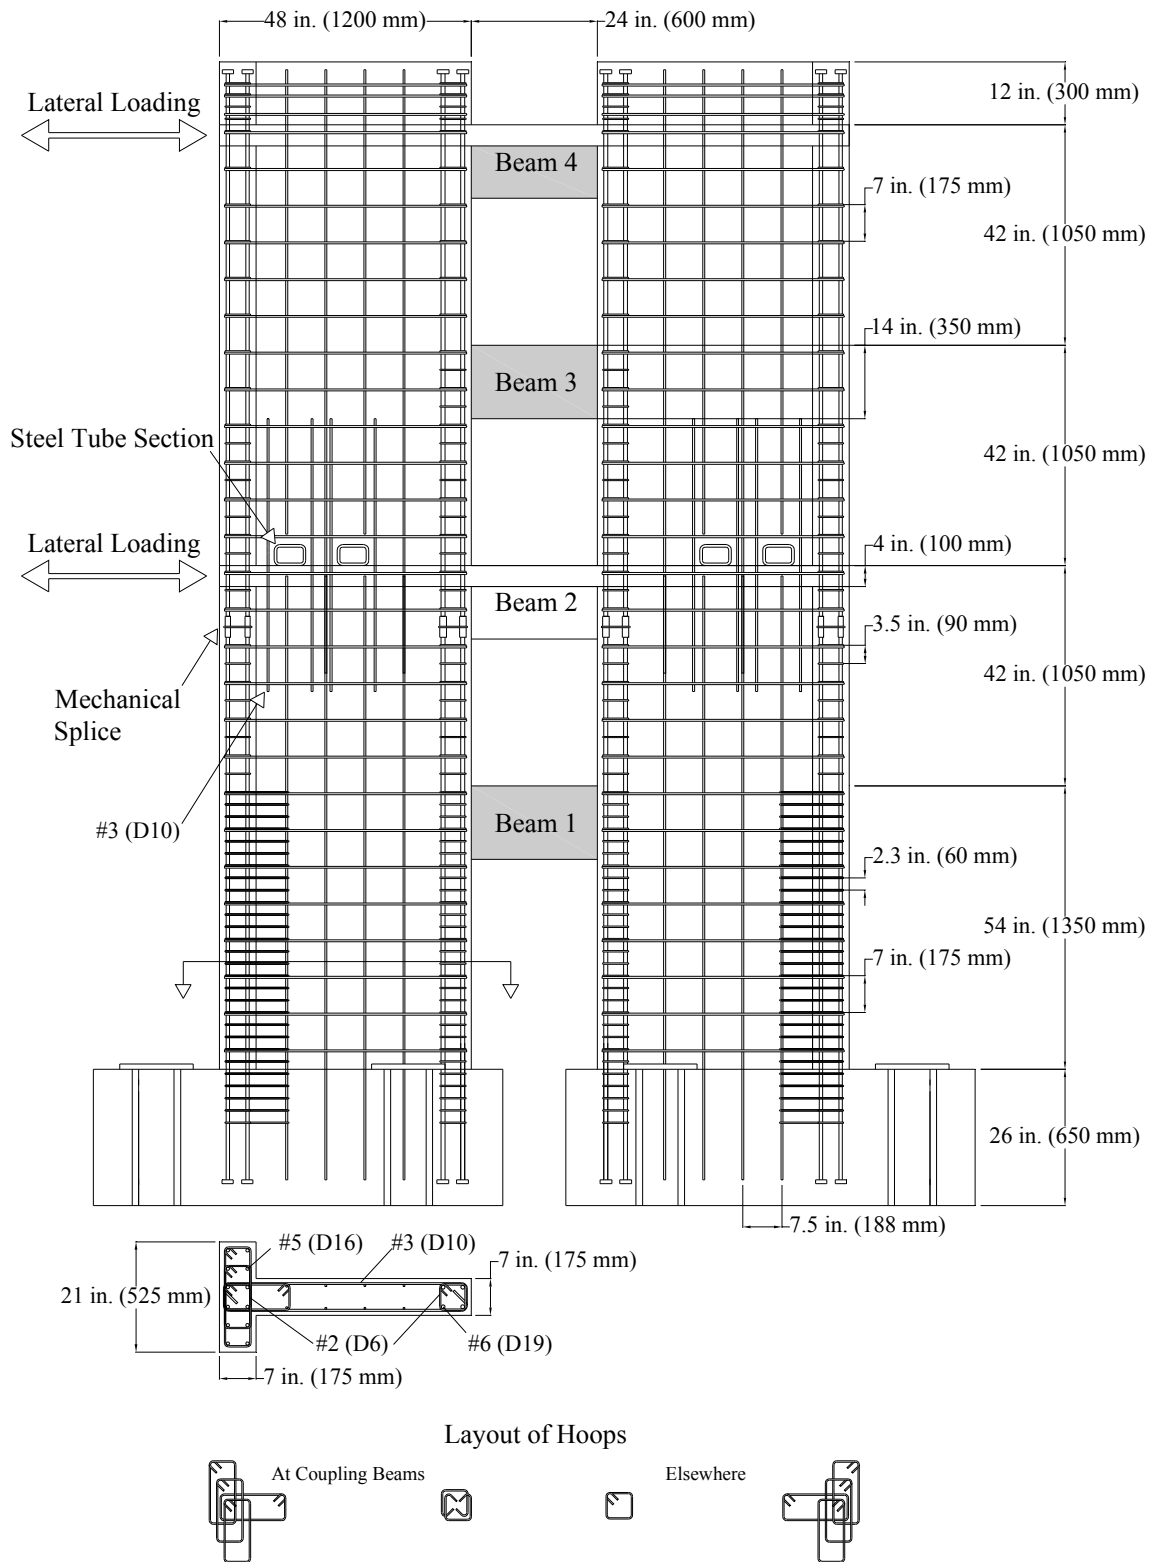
Specimen CW-1 reinforcement layout (shaded region is HPFRC)
